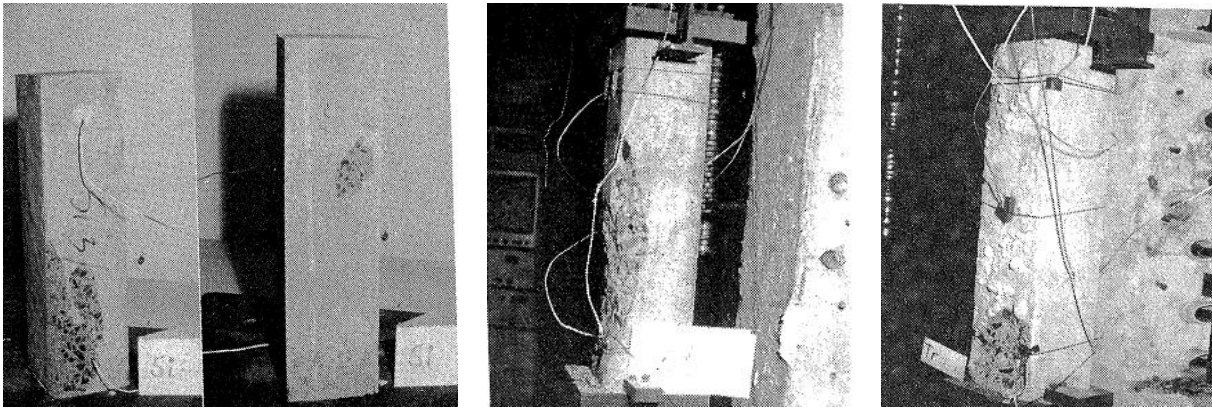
Spalling of Si-concrete, Lt-concrete, and Tr-concrete (Diederichs 1989 [48]).
